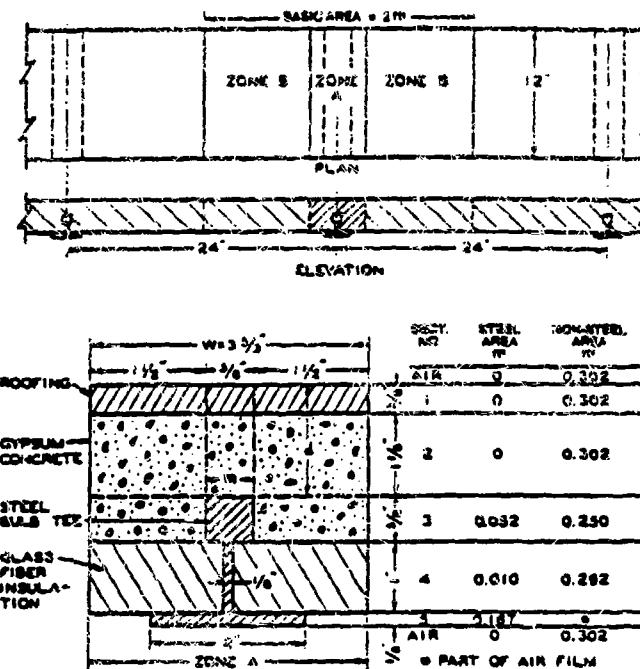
Gypsum Roof Deck on Built Tees (Example 4)
